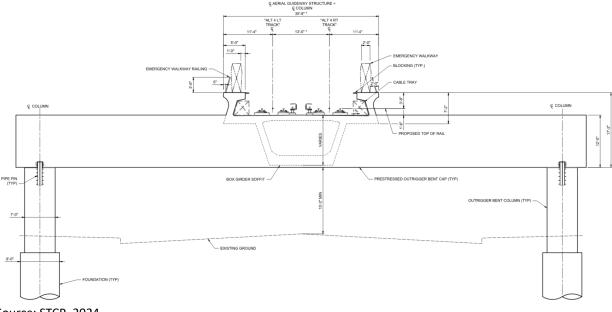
Typical Aerial Straddle-Bent Cross-Section
